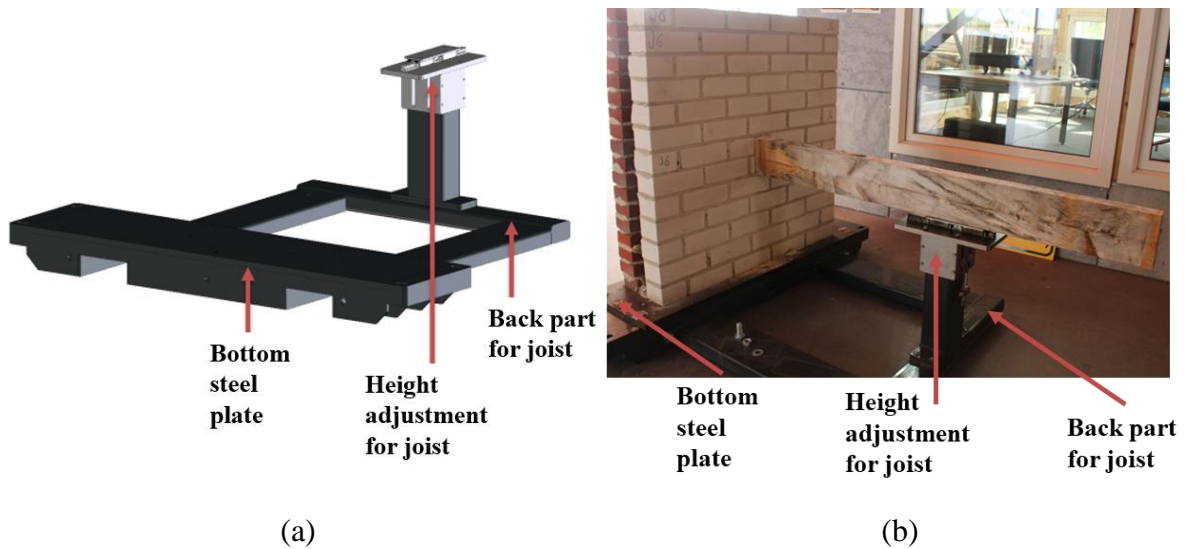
Detail of the bottom steel plate: schematic view (a) and photograph (b).
